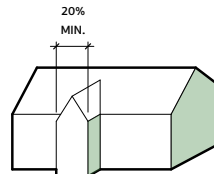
Intersection gable to be minimum of 20% width of overall facade
